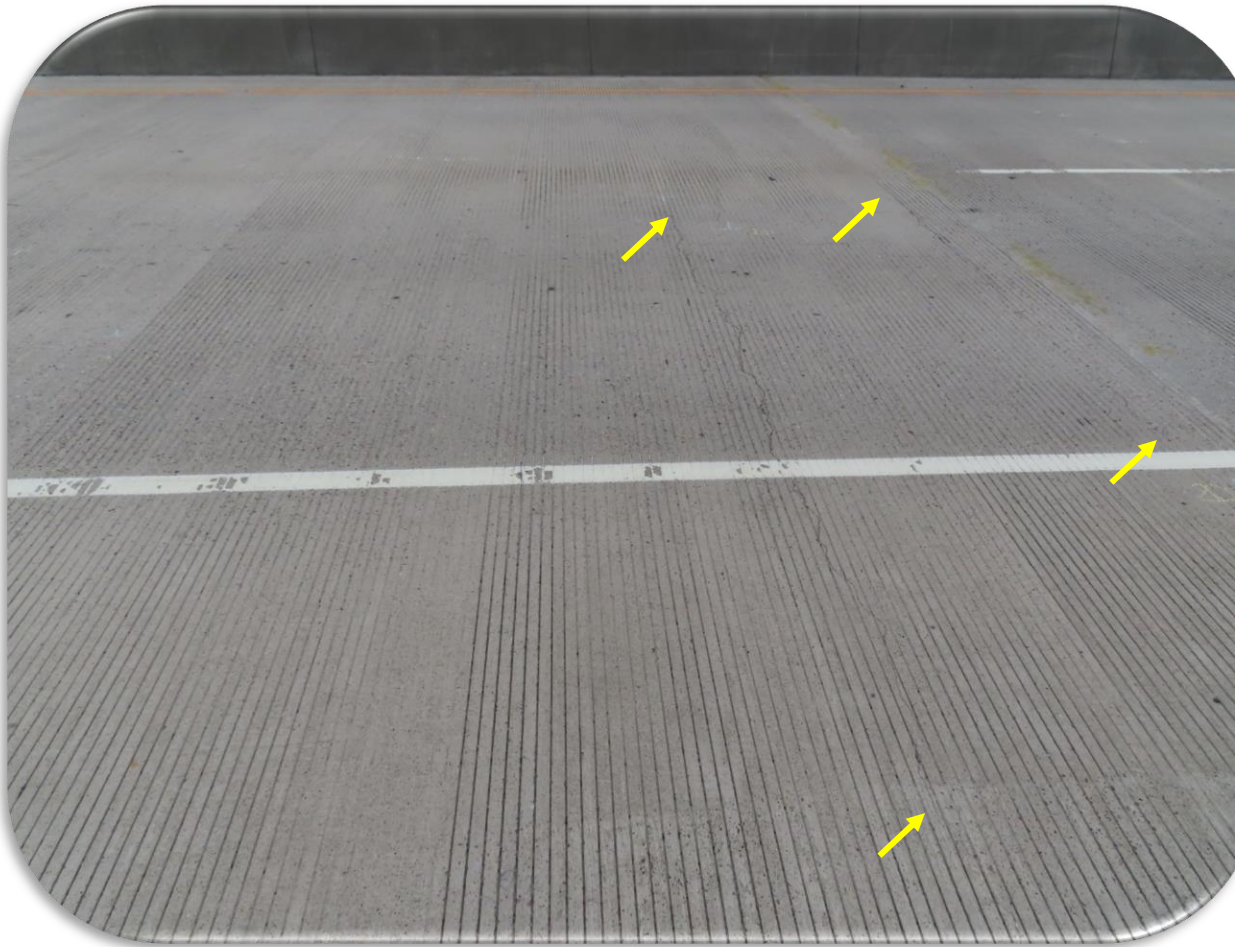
Bonner Bridge Phase I (EB) - 2020 inspection - Typical deck topside transverse cracks, placement 5.
